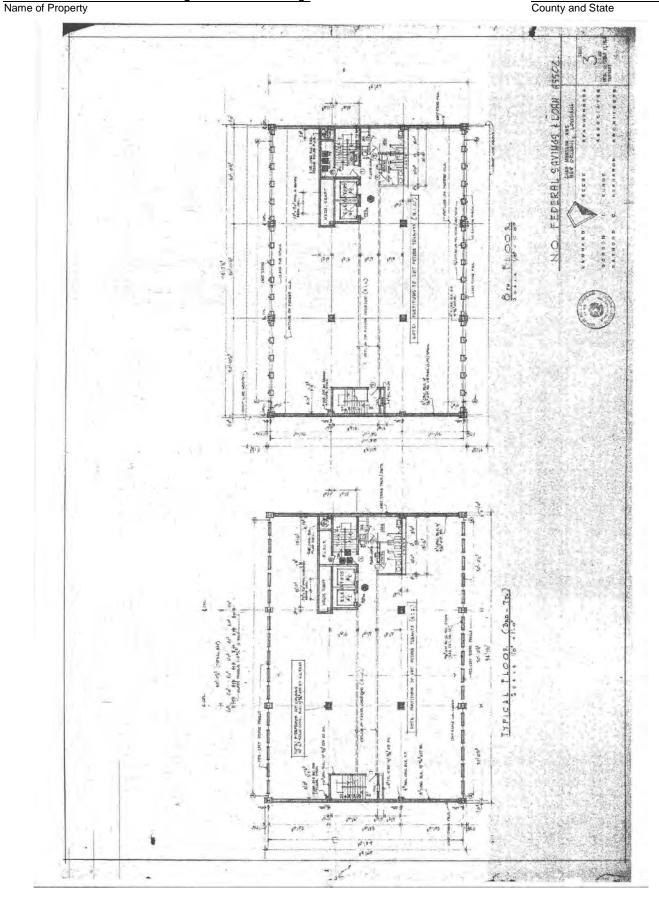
Original Plans – Third through Eighth floor plans. Image courtesy of Reggie D. Winfield.
